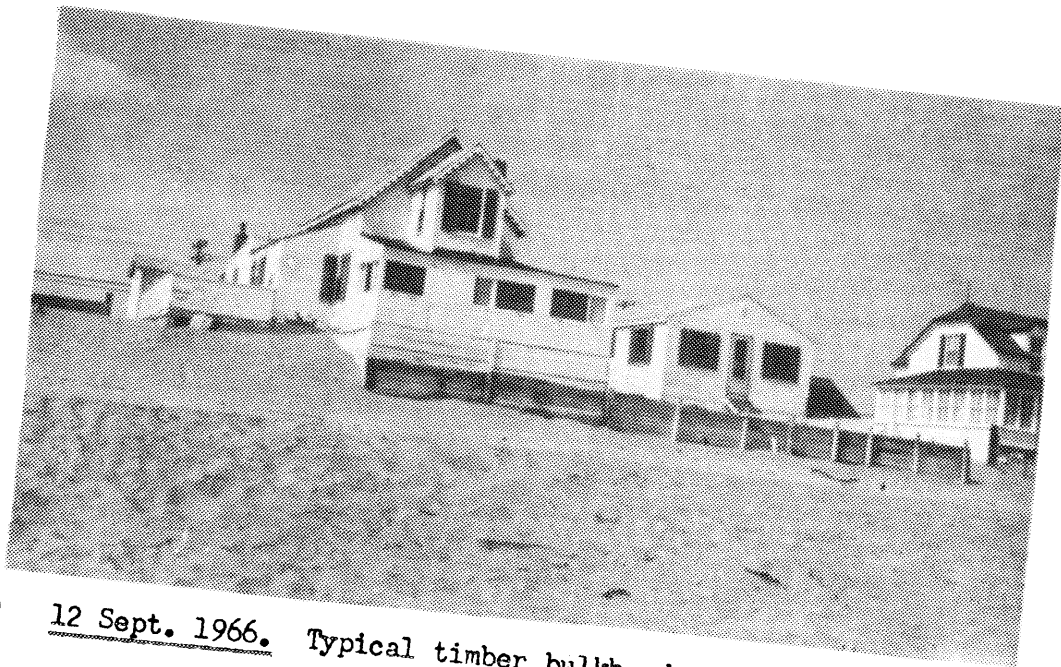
12 Sept. 1966. Typical timber bulkhead.
